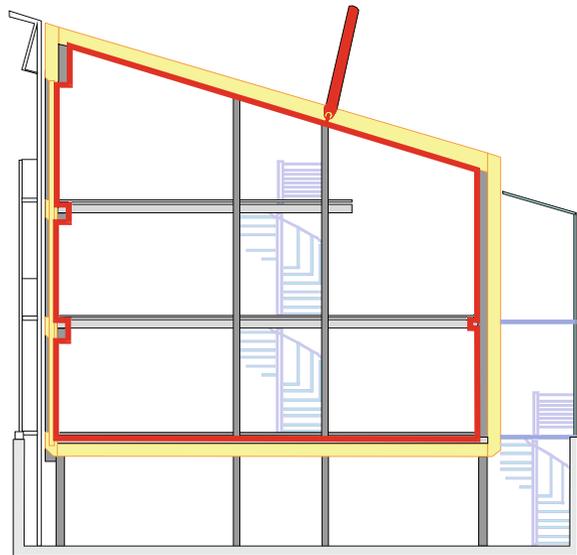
Examples of thermal bridges: parapets, doors, slabs
